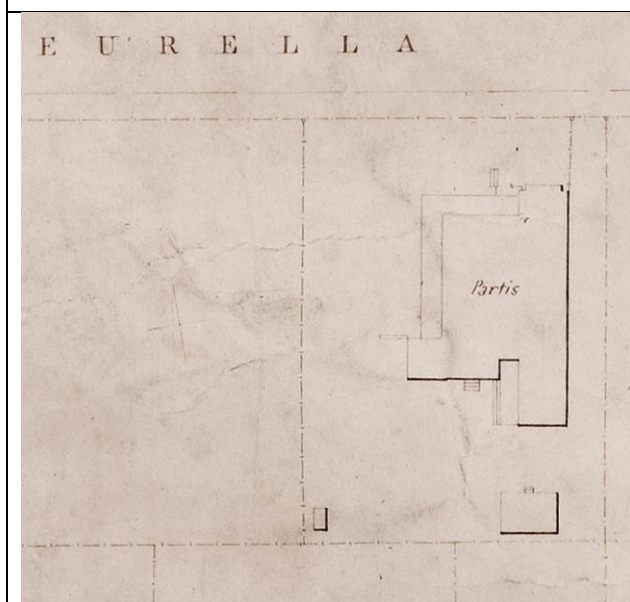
Circa 1894 "Block Survey Plan" showing the outline of the site and outbuildings, well, and the adjacent house.
